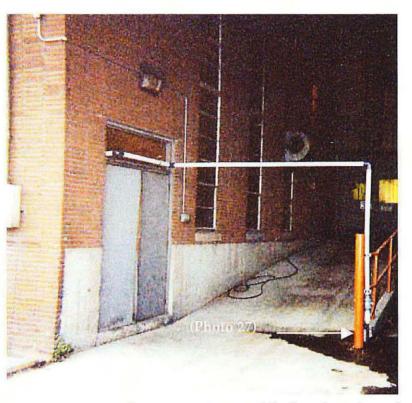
Looking west, picture of the location where the water supply plumbing exits the Tecumseh facility and is brought to an accessible location in the Recycling Dock Area.
